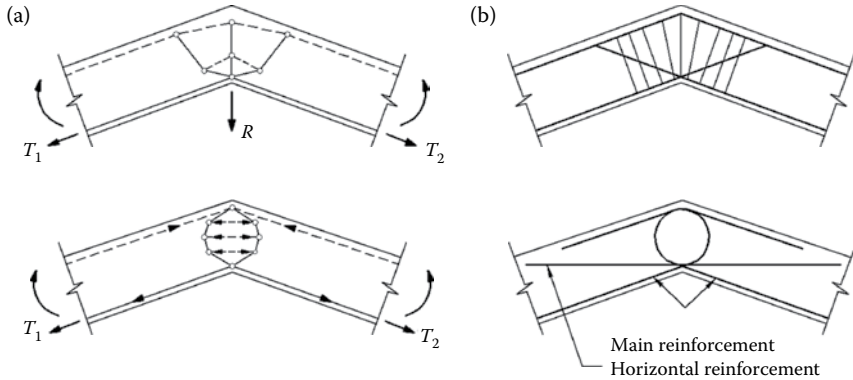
STM* and the corresponding reinforcement details for an obtuse corner joint under an opening moment: (a) *STMs* and (b) corresponding reinforcement details.
